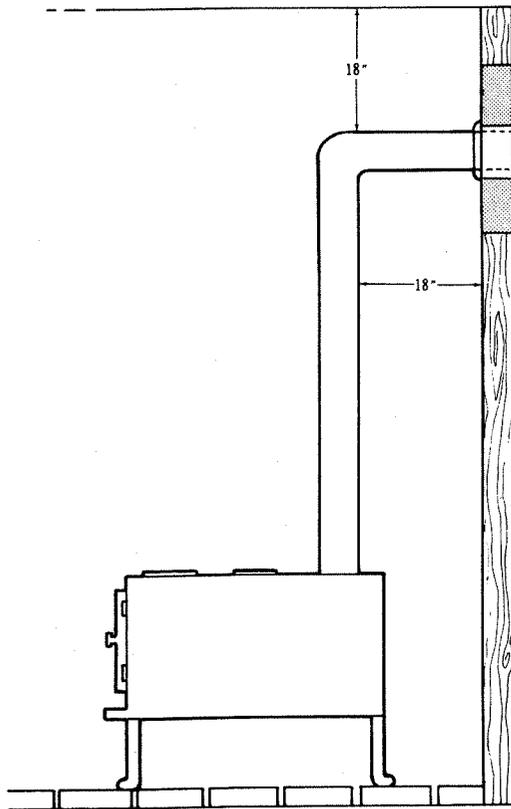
Suggested minimum clearance of stovepipe from combustible surfaces.
